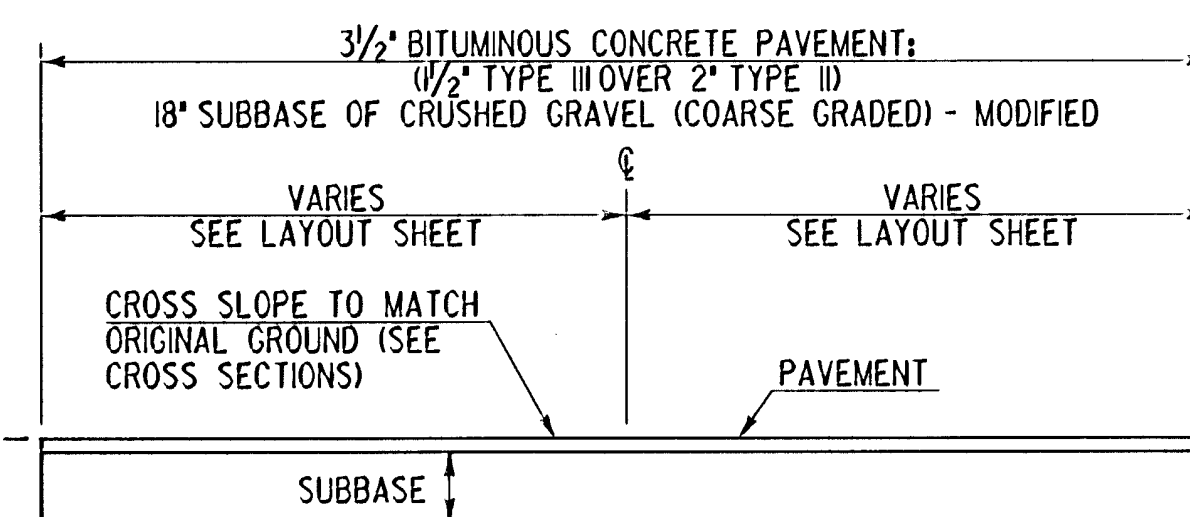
DETAIL OF U.S. ROUTE 5 / VT. ROUTE 11
